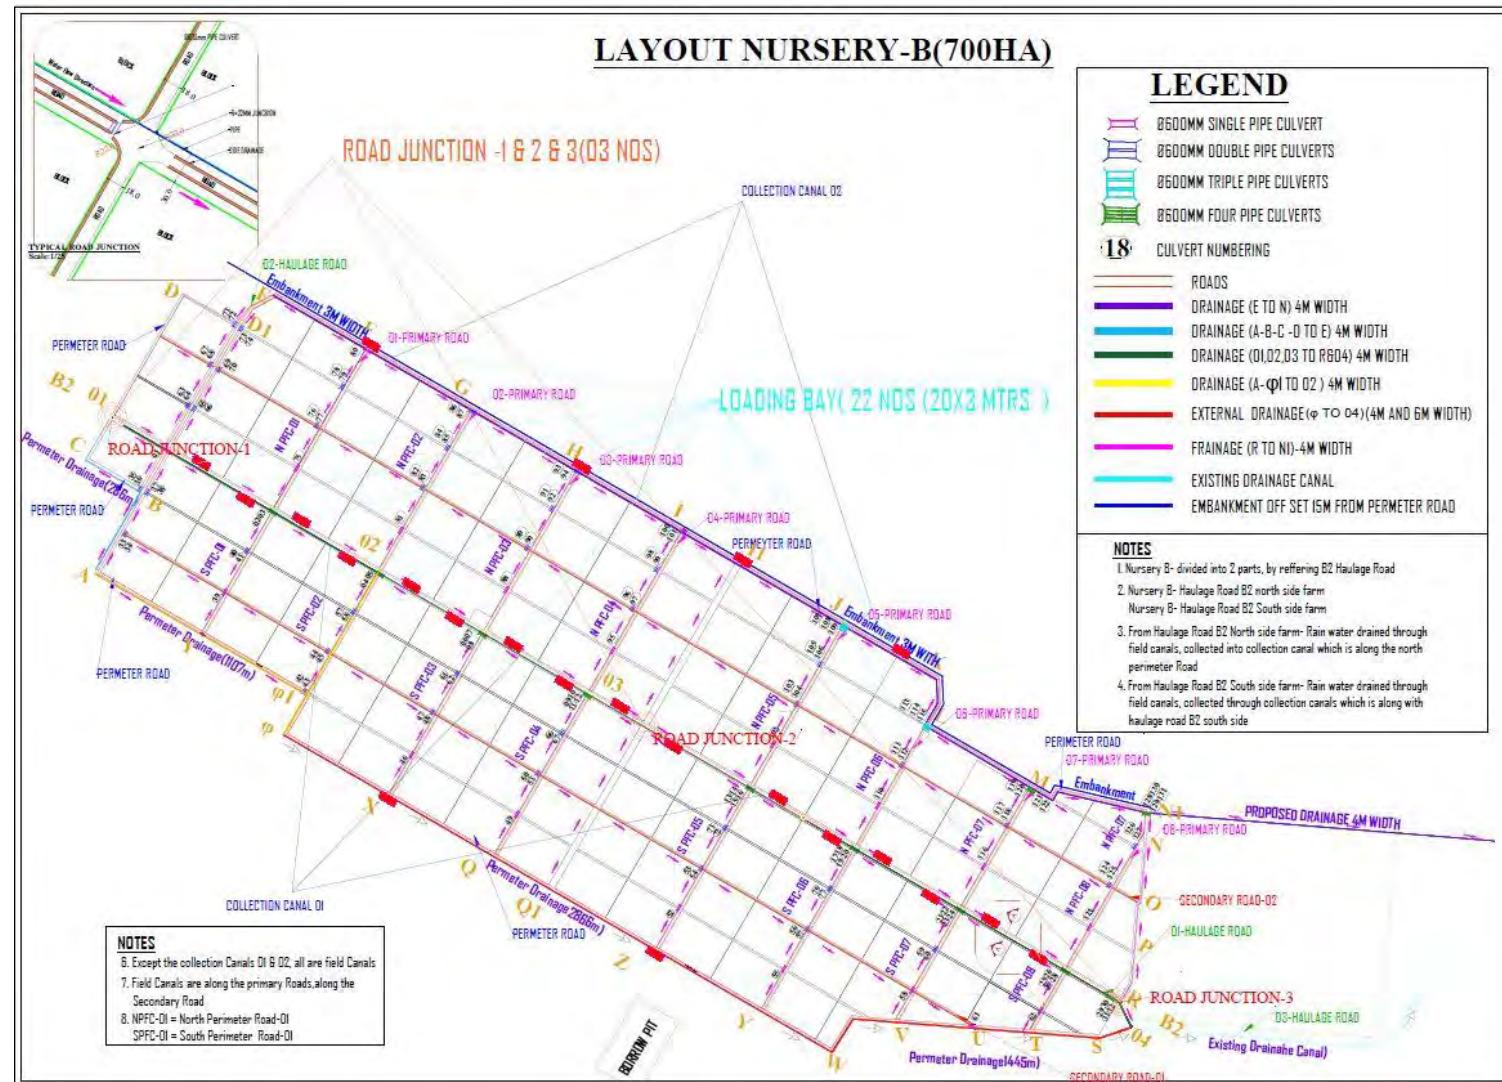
INTAKE 2 DEVELOPMENT PLAN
